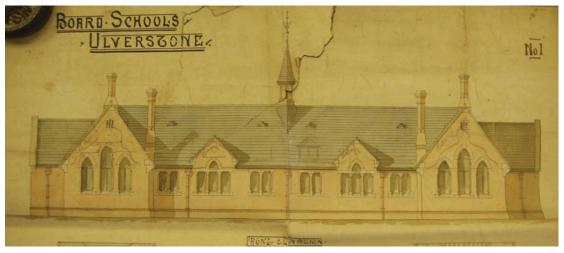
Front (south-east) elevation as shown in the original drawings of 1875 (CRO(B) Z1041 1875-1904)
